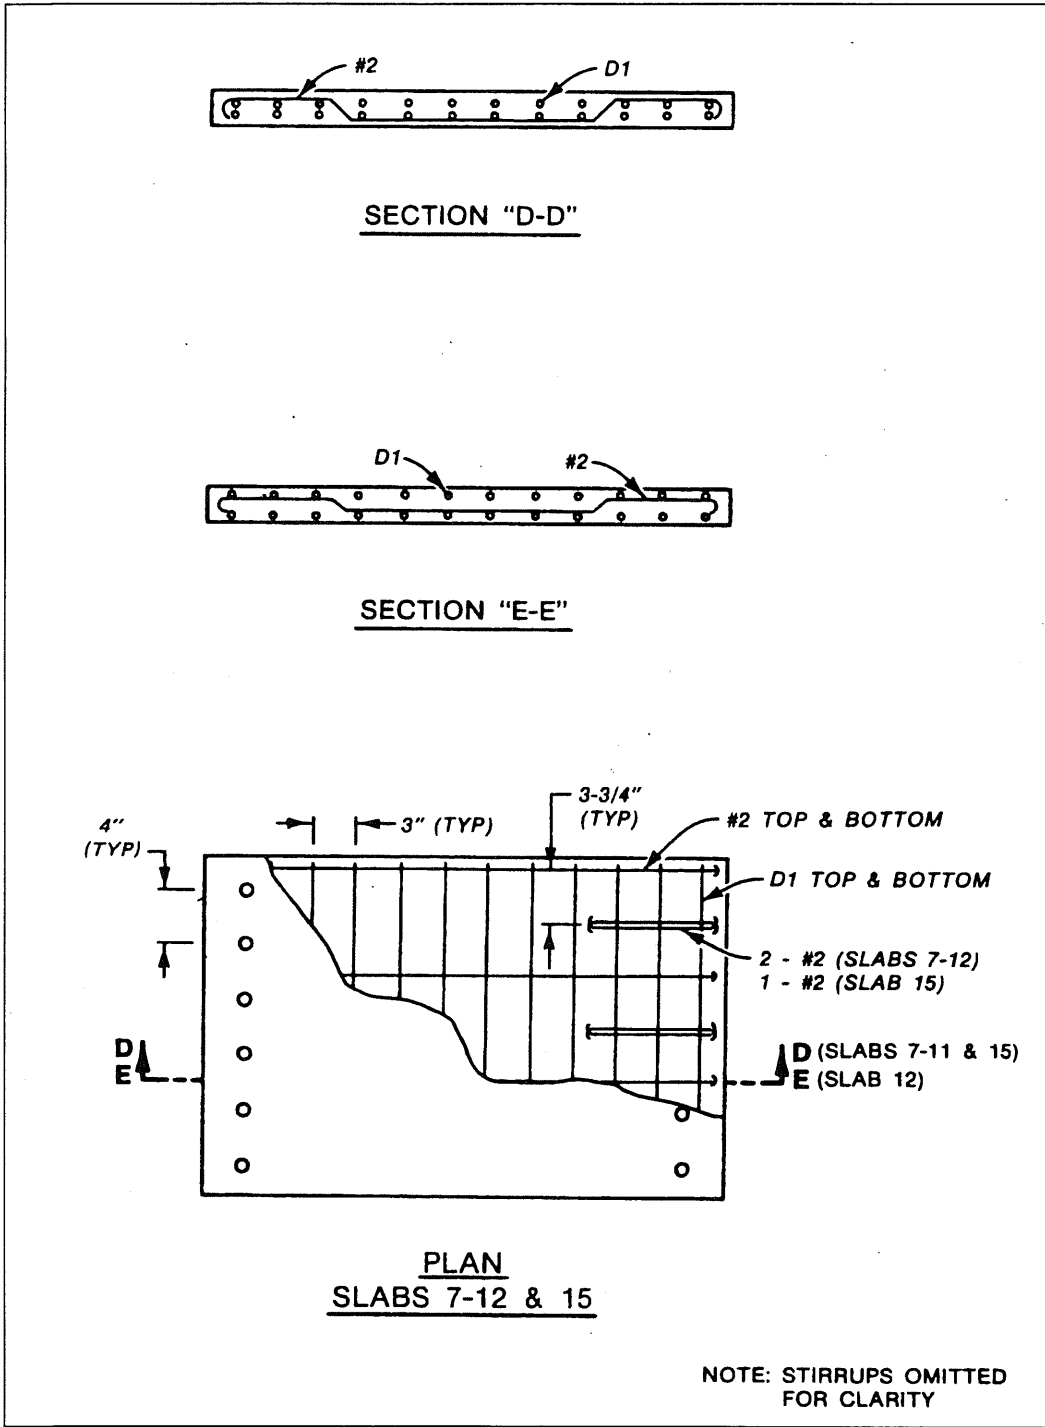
Slabs 7-12 & 15 Plan Details (Woodson et. al., 1985)
